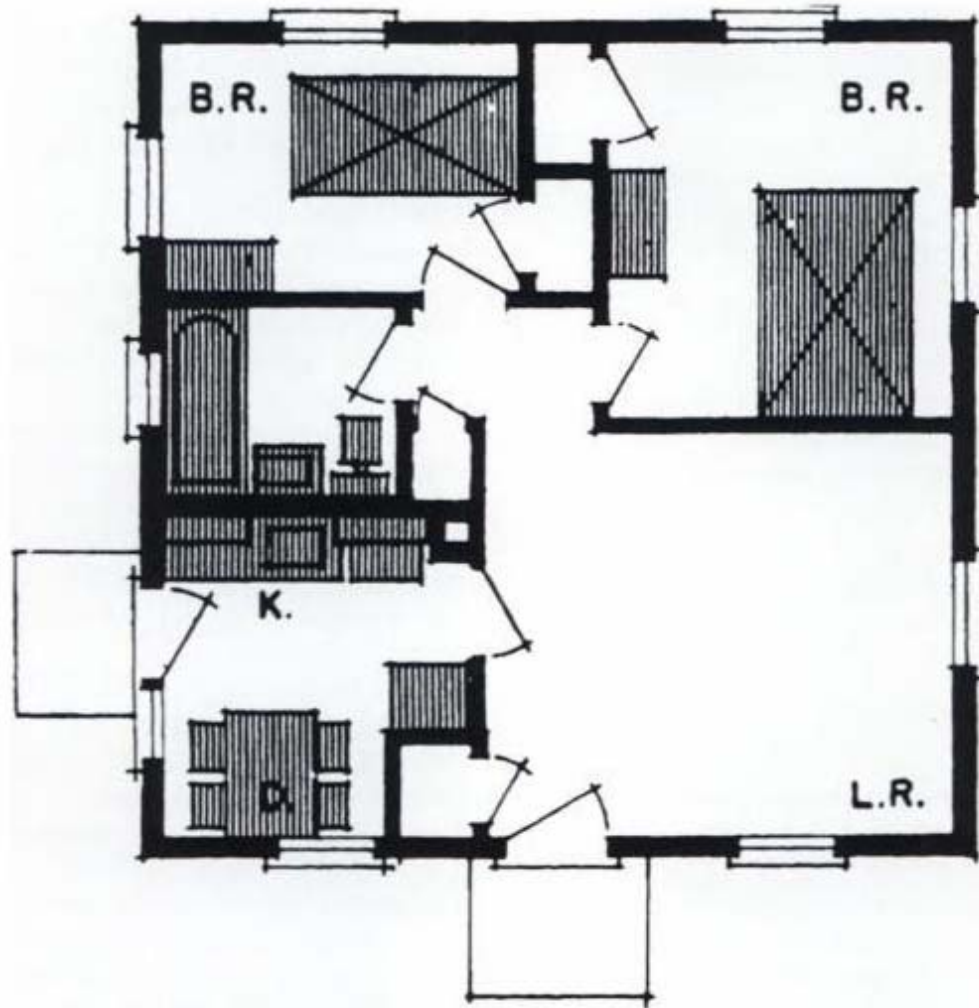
, FHA minimum house floor plan (*Magnetic Los Angeles: Planning the Twentieth Century Metropolis*, p. 68)
